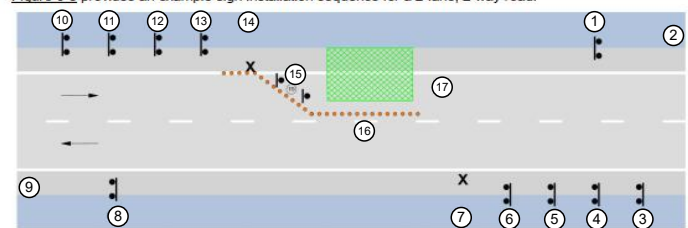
Example sign installation sequence for a 2-lane, 2-way road
